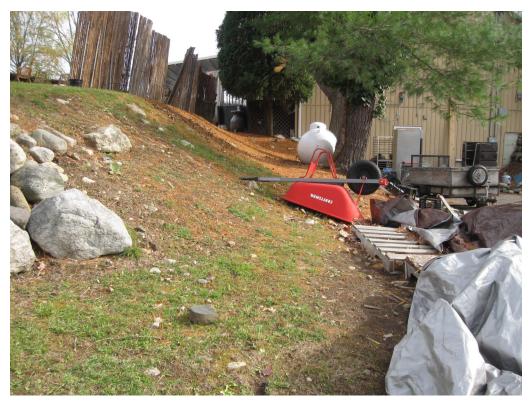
Left side downstream slope of the dam looking left toward the restaurant.
